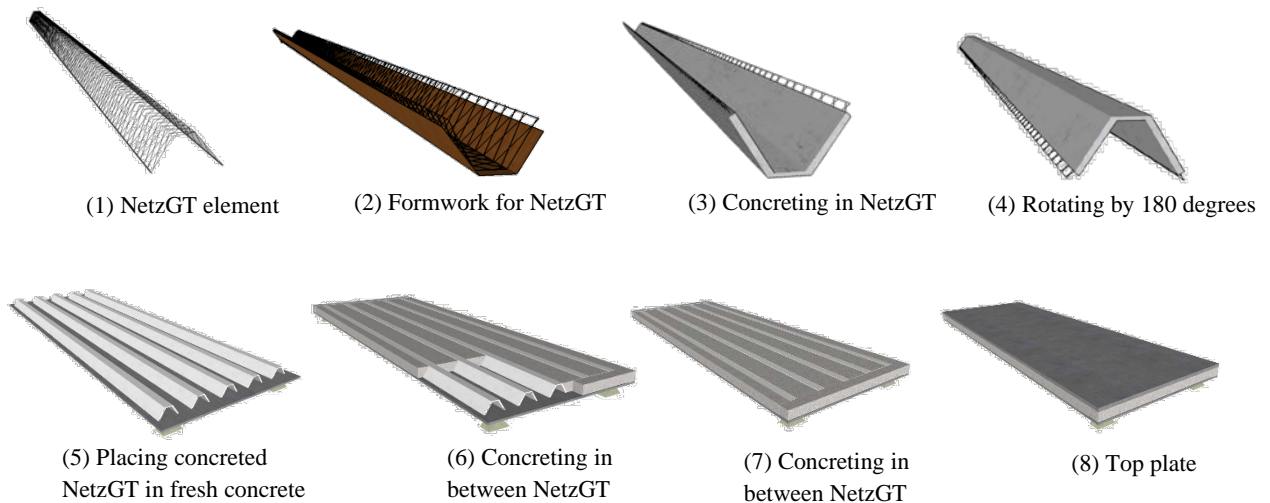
Step-by-step guide for the construction of a HC slab system with NetzGT reinforcement
